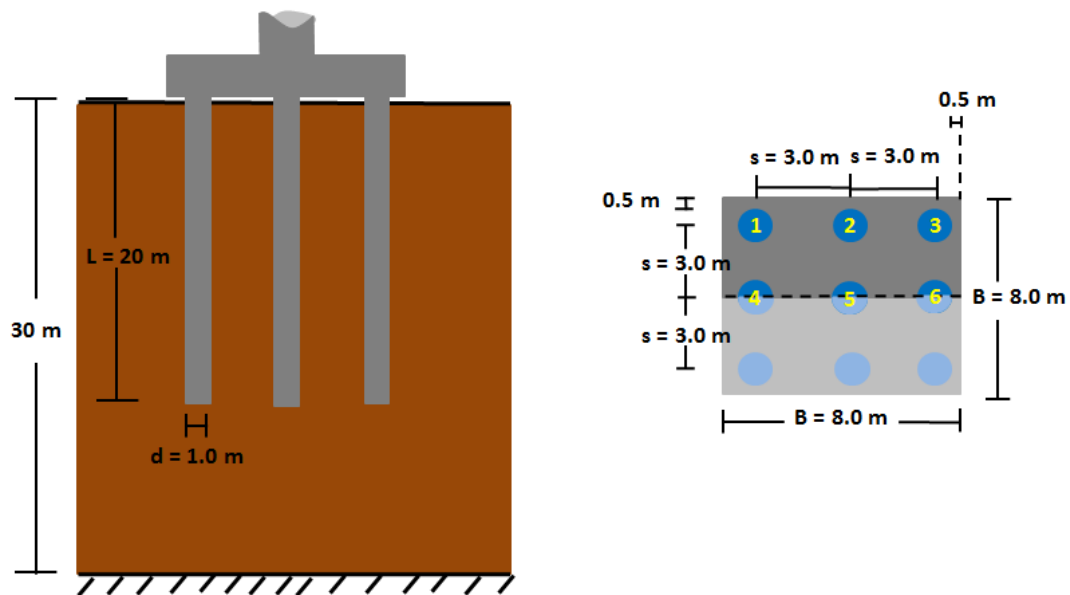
Final configuration of the conventional pile foundation. Section and plan view.
